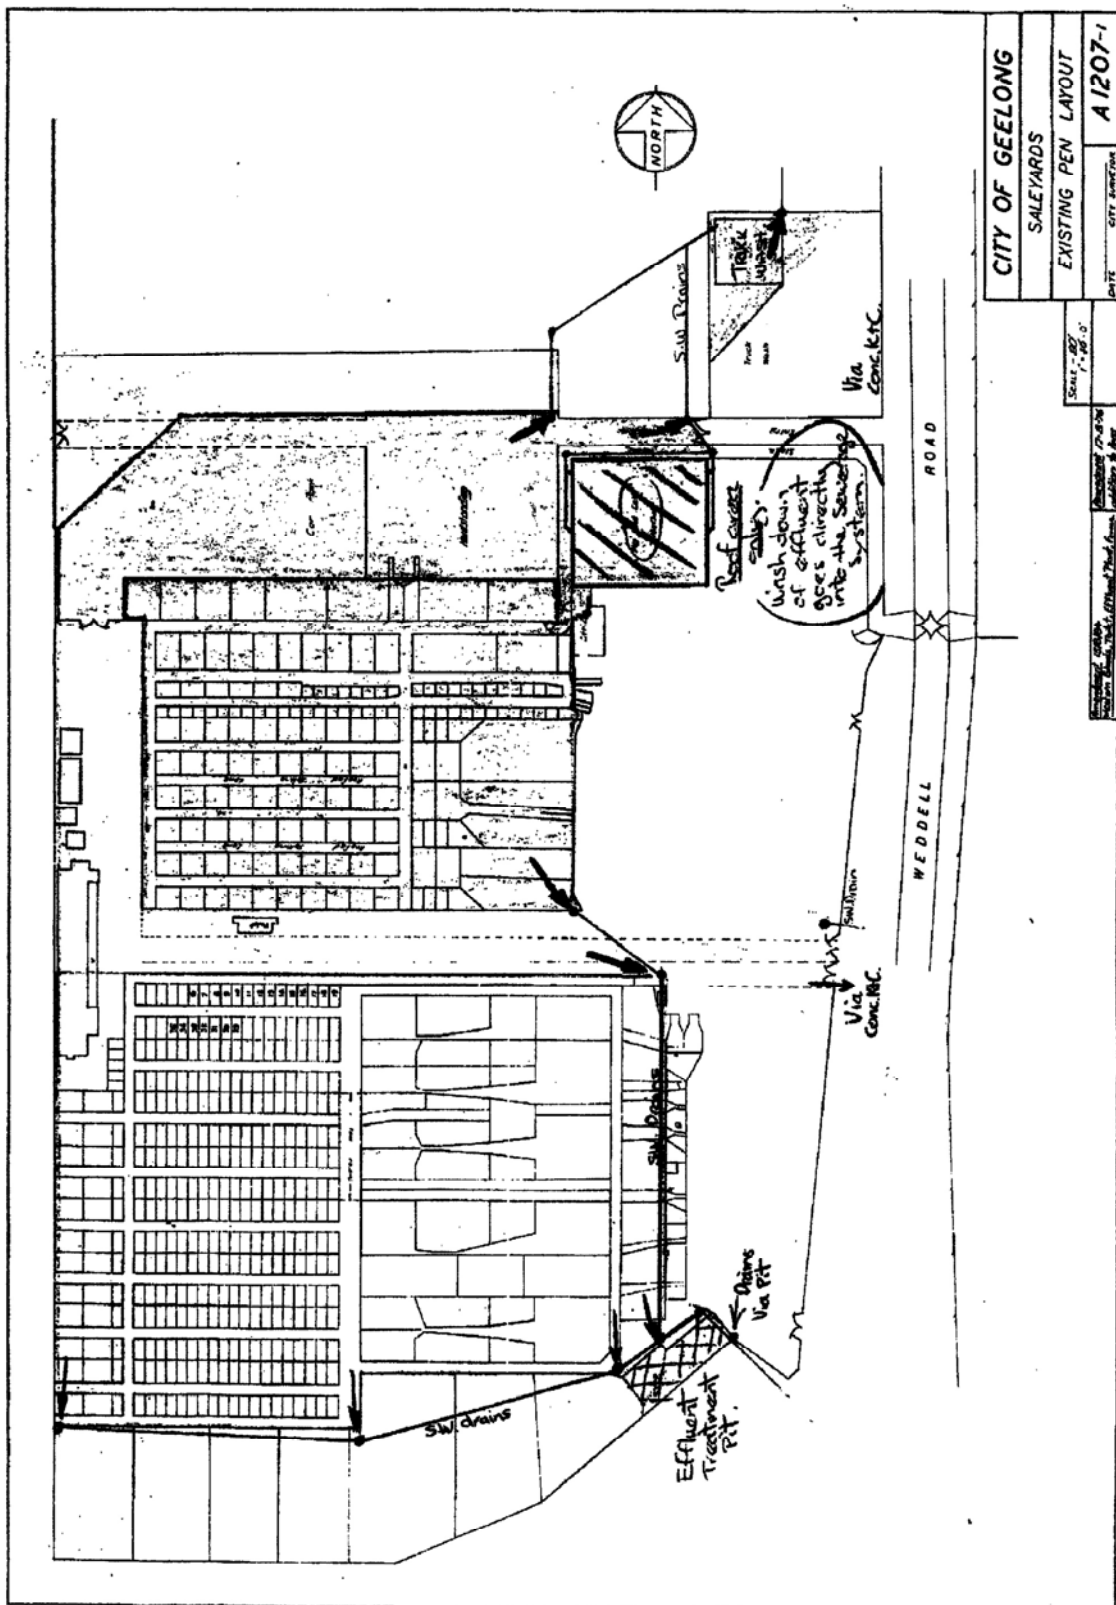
Geelong Sale Yards – plan of existing pen layout (showing extent of extant pig pen), 17 August 1976. Source: Barwon Water, Drawing A1201-1, Geelong.
